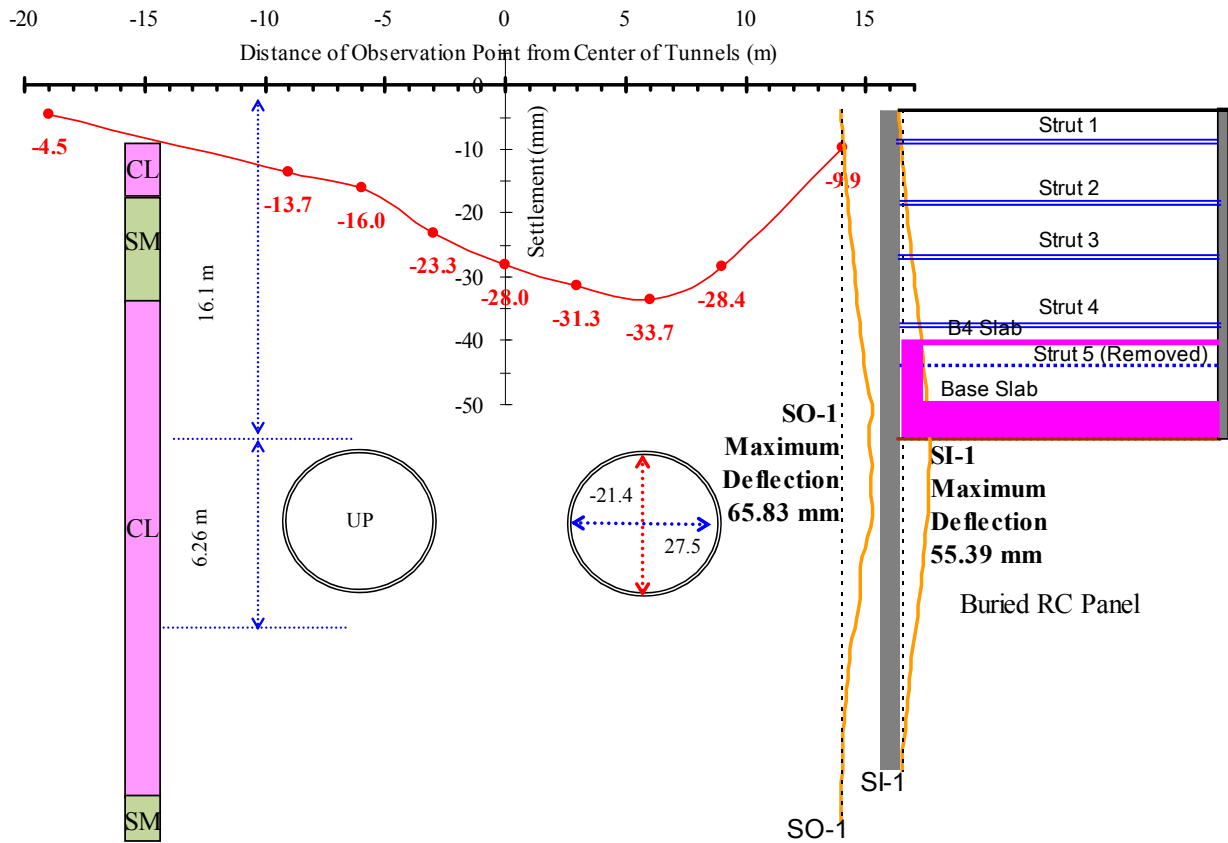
Ground settlement and lateral deflection of ground and wall at the construction of B4 slab
